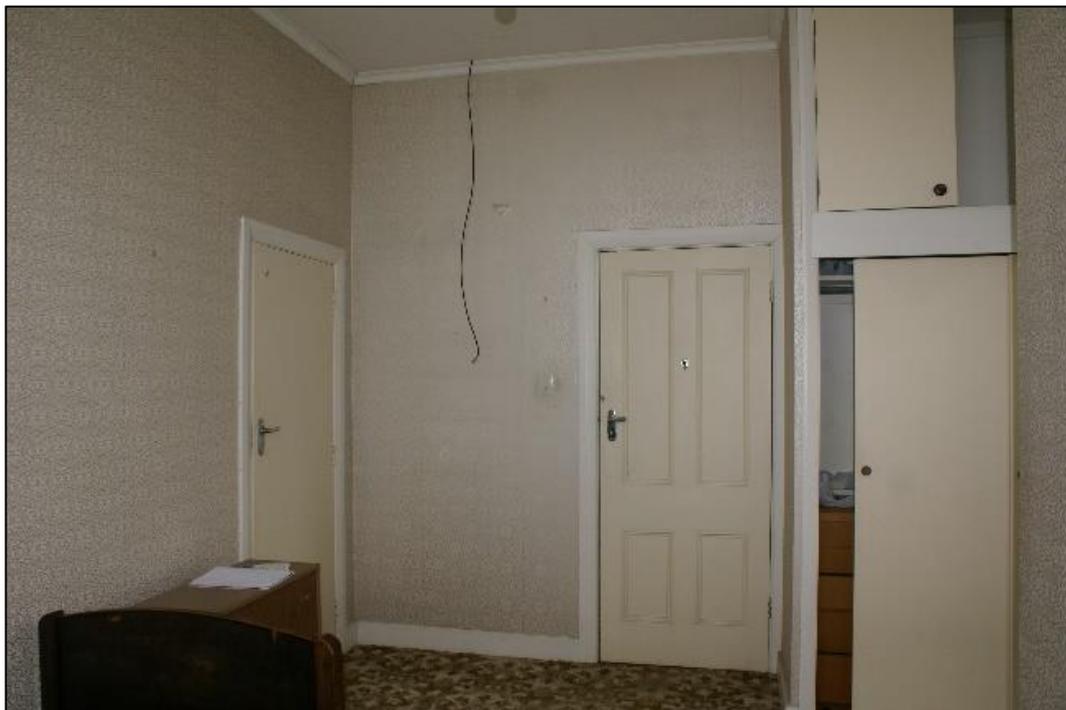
Southwest corner of Room 3 showing door through to Room 3 (modern) and Room 4 (four-panelled). Note the modern joinery.
